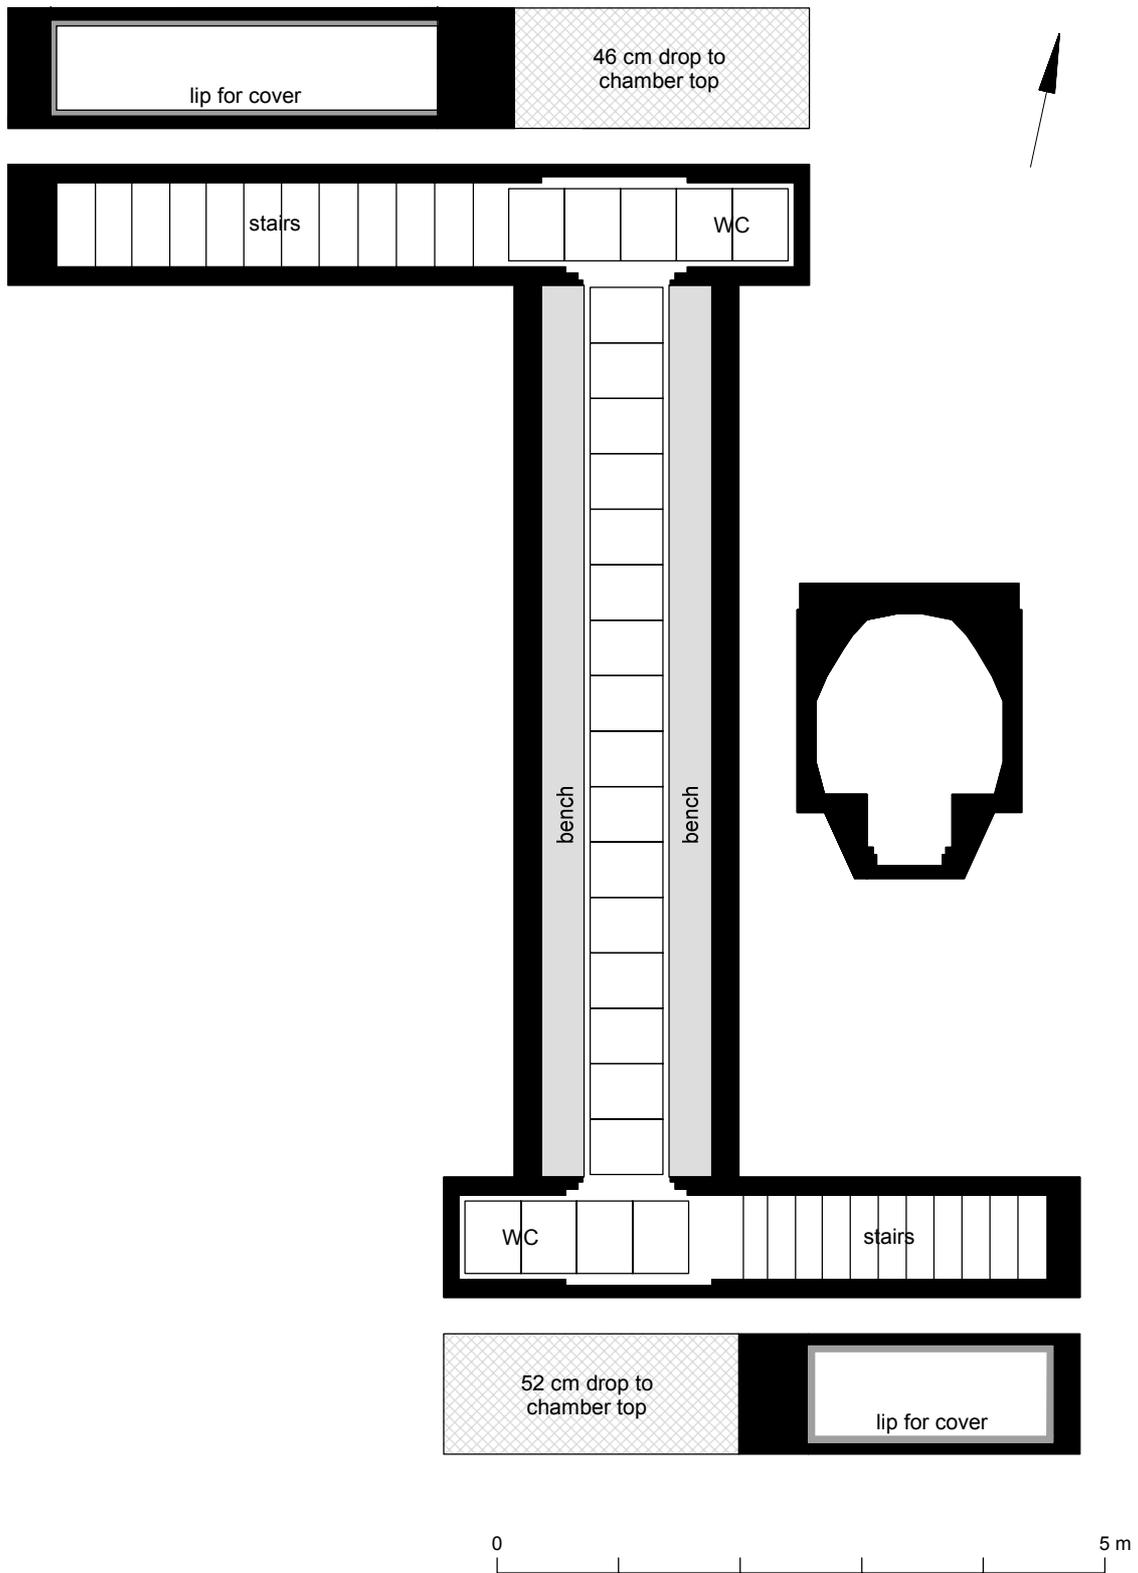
Area J1, air-raid shelter F11: internal plan and cross-section of chamber.
